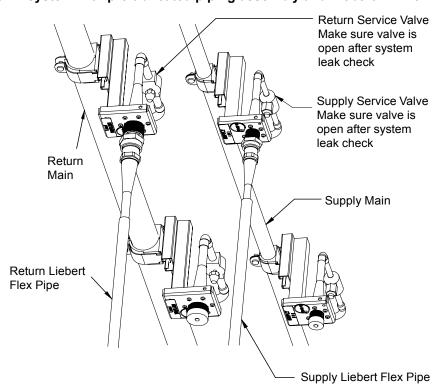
Detail view of Liebert XD Flex Pipe and prefabricated piping port
